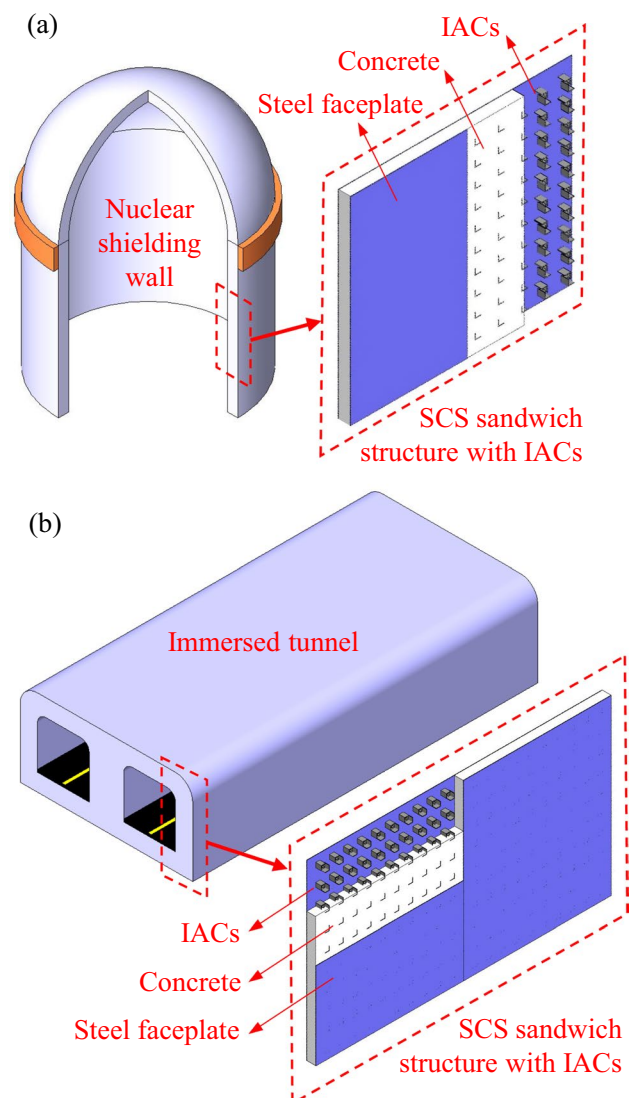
Application examples of SCS sandwich structure with IACs: (a) Nuclear shielding wall and (b) Immersed tunnel
